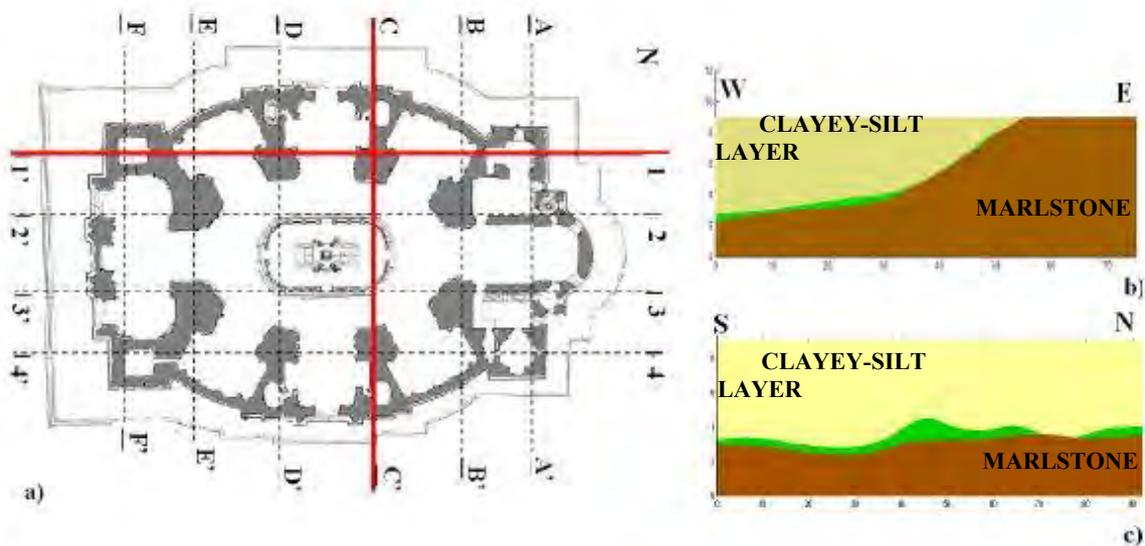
(a) position of the generated vertical cross-sections; (b) section C-C' West-East; (c) section 1-1' South-North [3].
